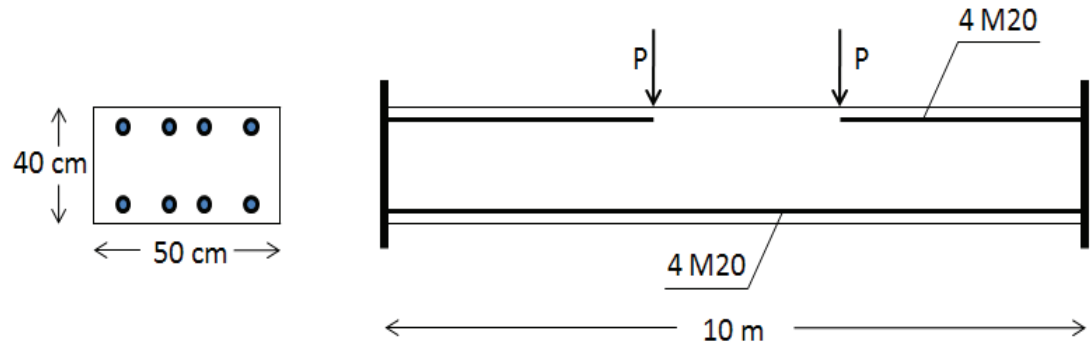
Reinforced Concrete Beam Used to Verify the modeling Procedure
